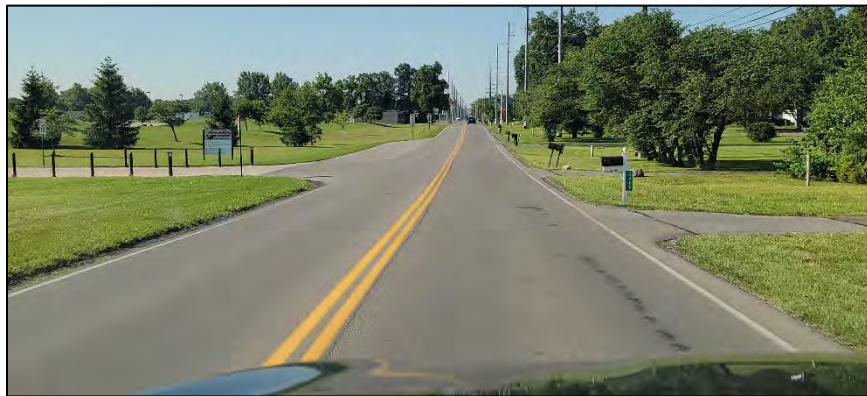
Apollo Career Center driveway, with not center two-way left turn lane to help remove turning vehicles from through traffic
